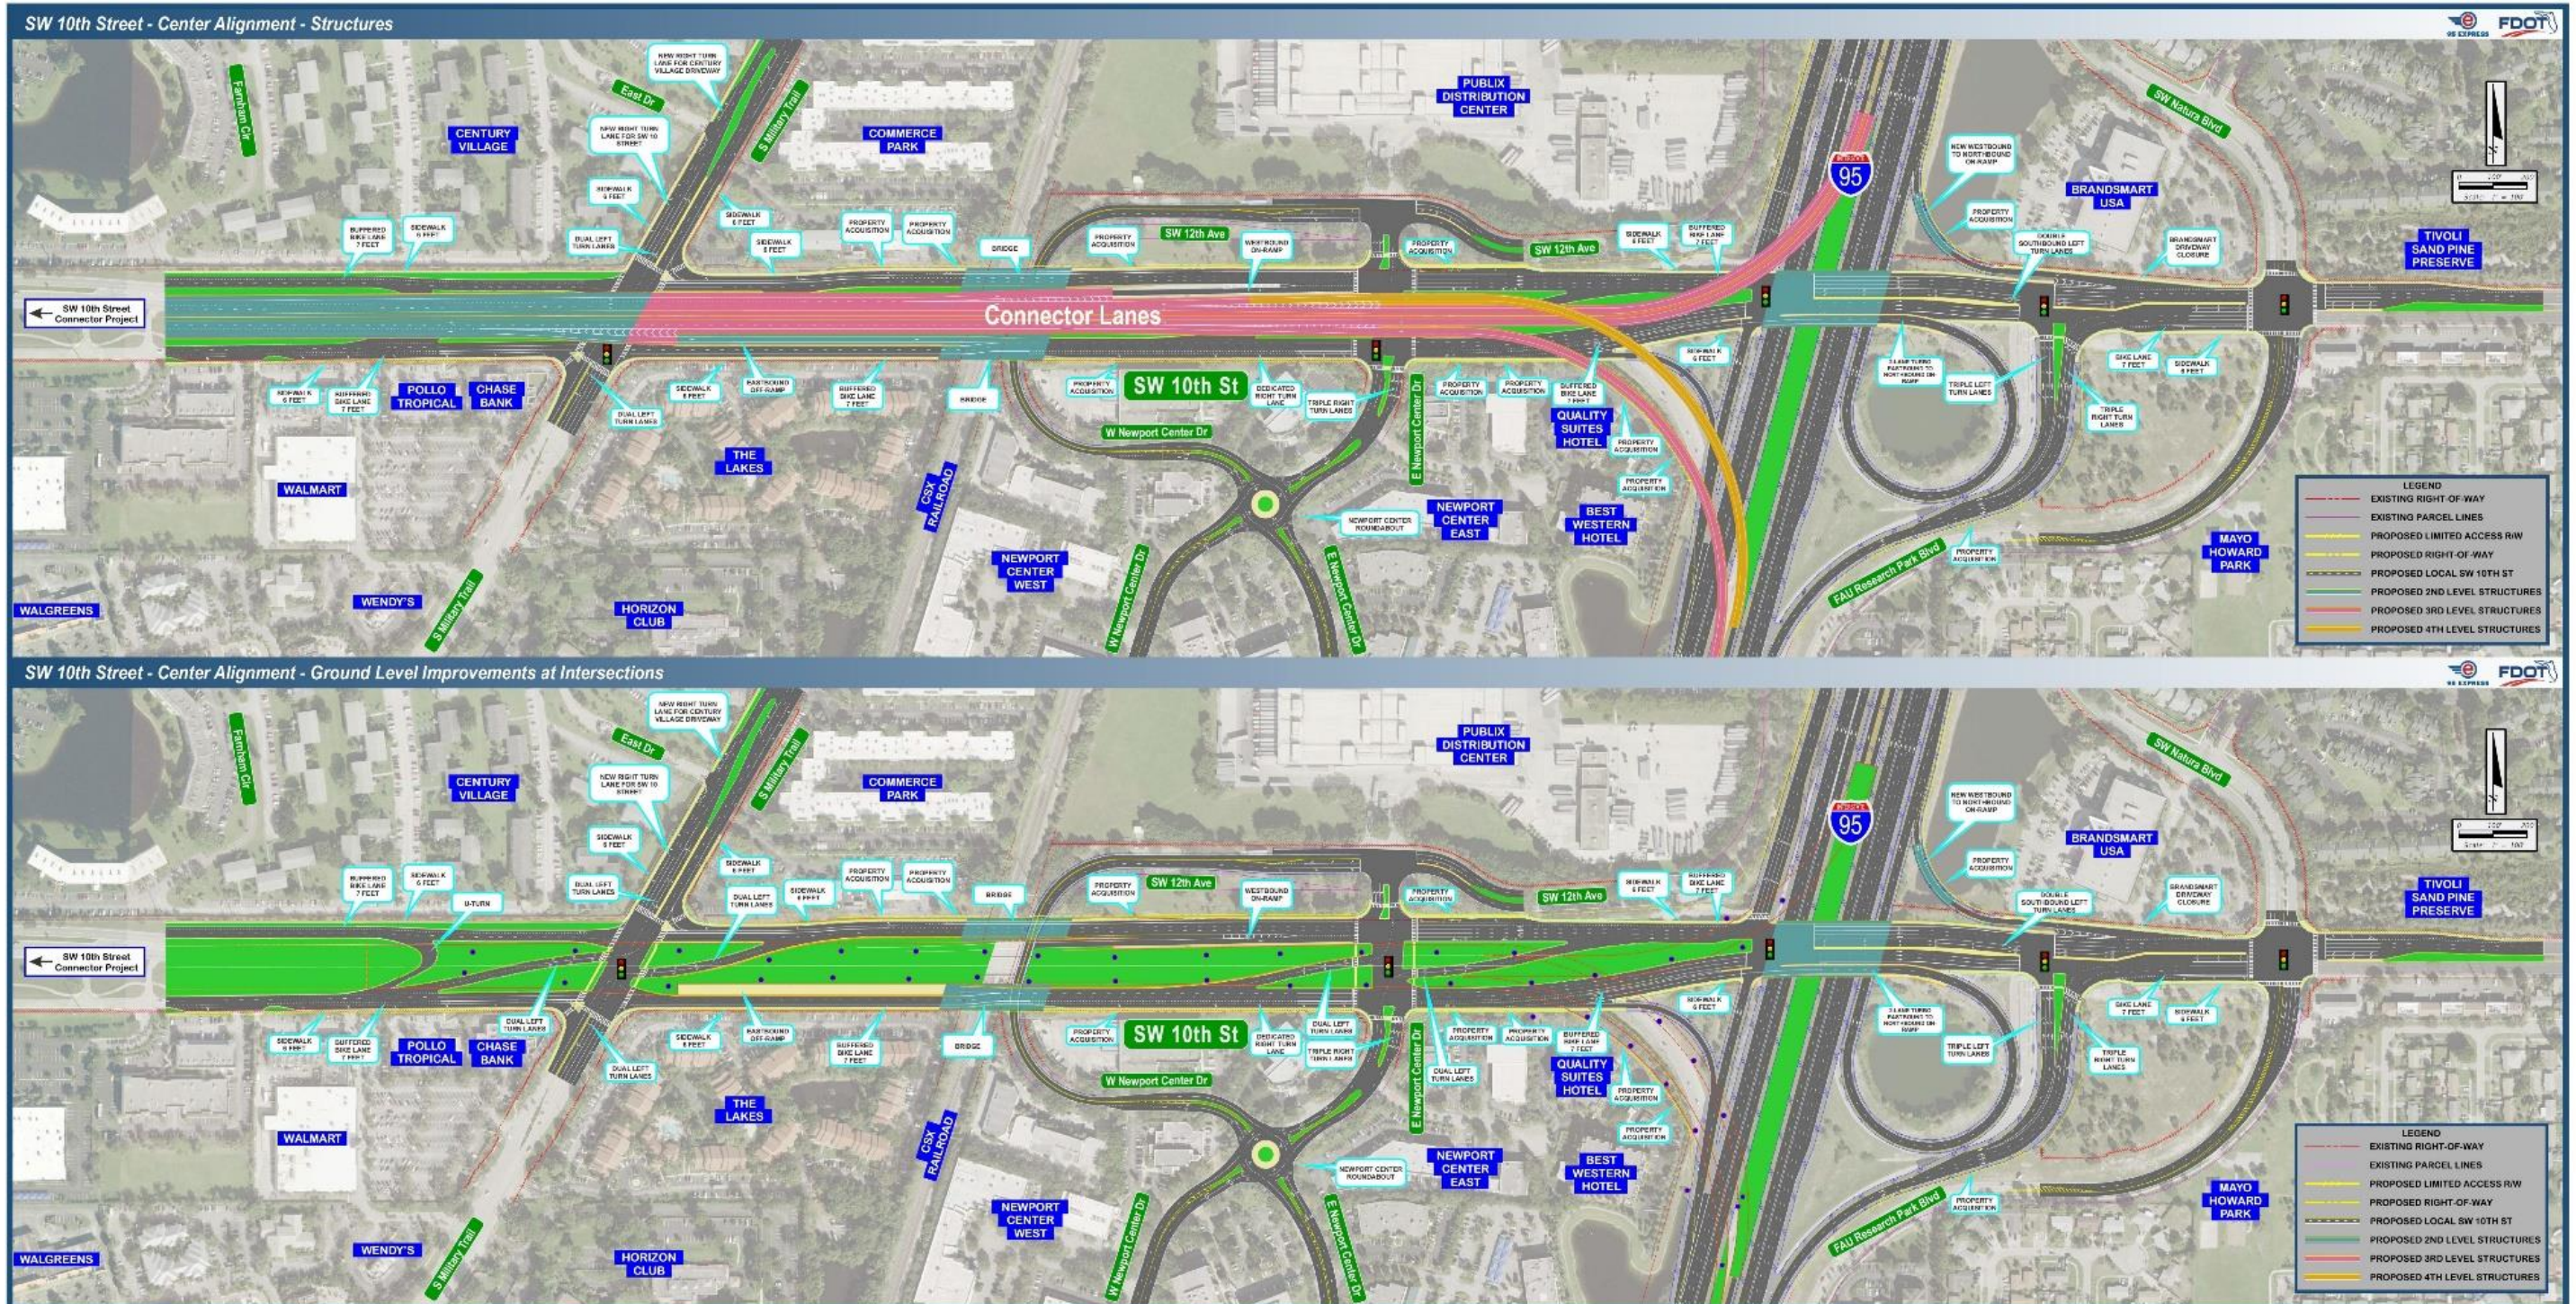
4: SW 10th Street - Center Alignment Concept Plans
